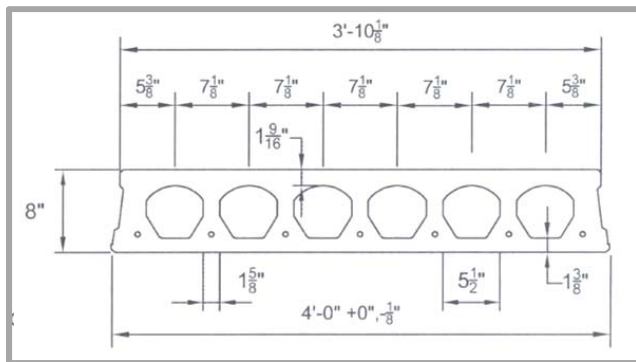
Cross Section of Hollow Core Plank from 'Nitterhouse Concrete Products'
